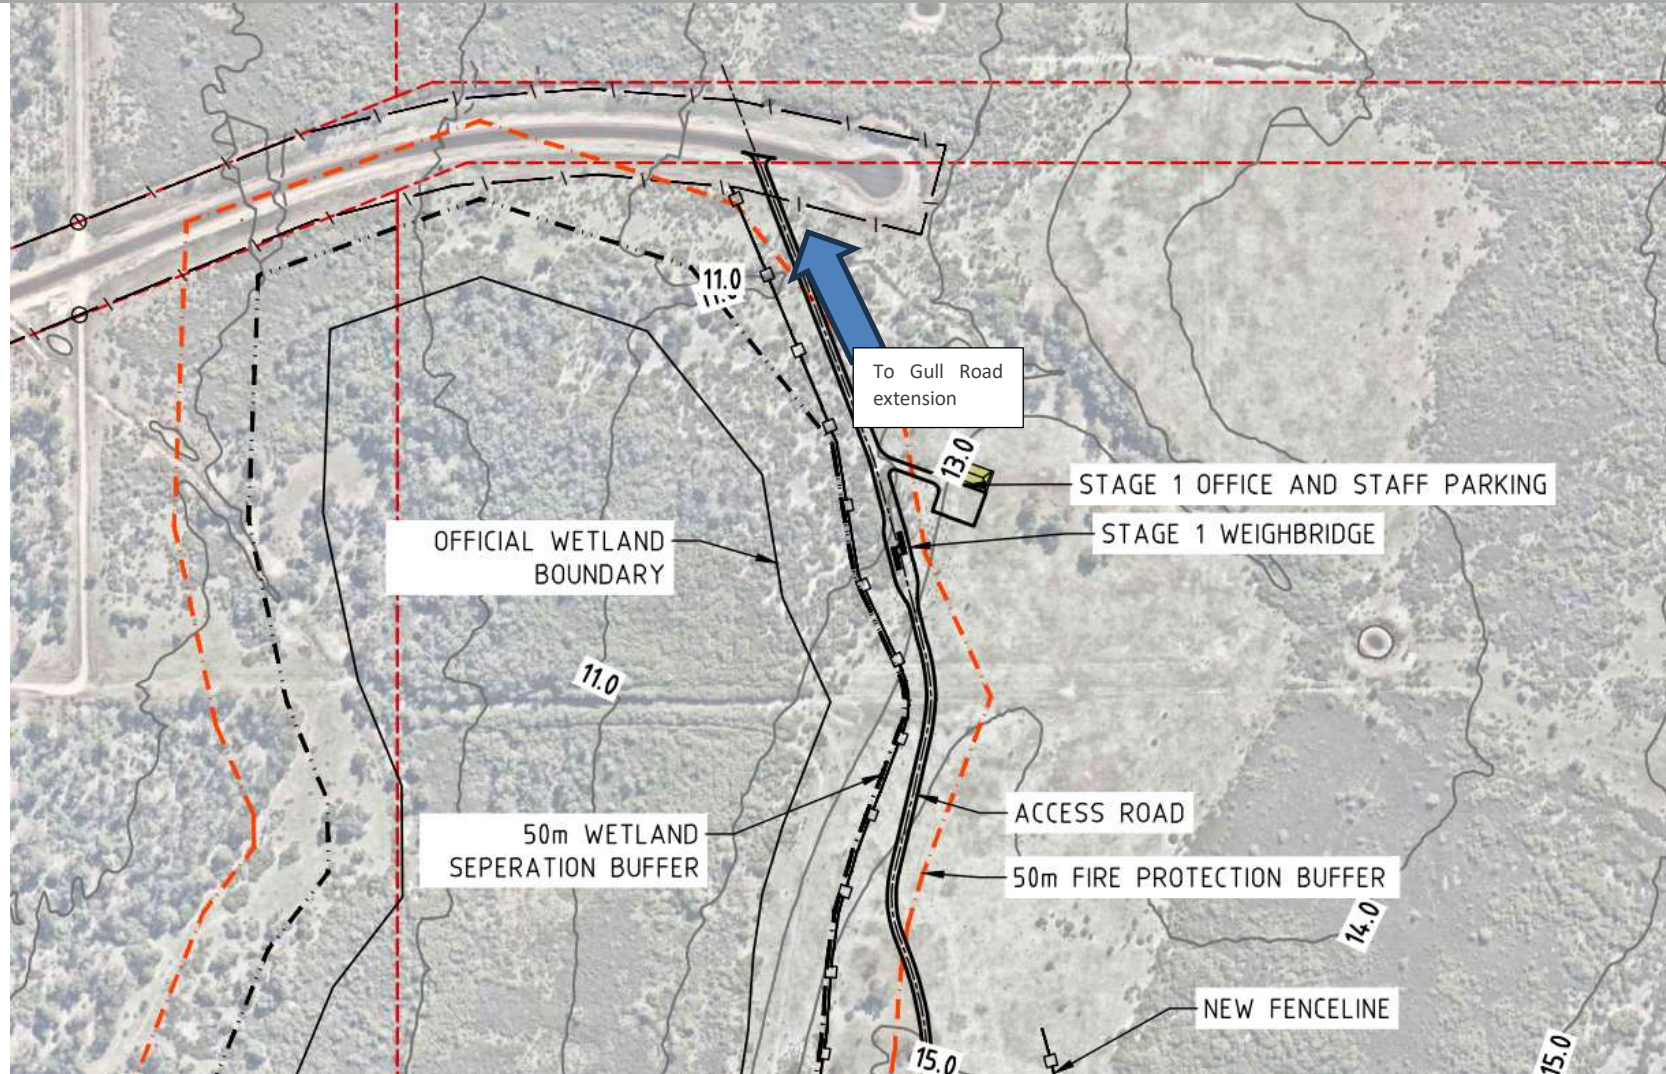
Site Access Details of Proposed Site (not to scale)
